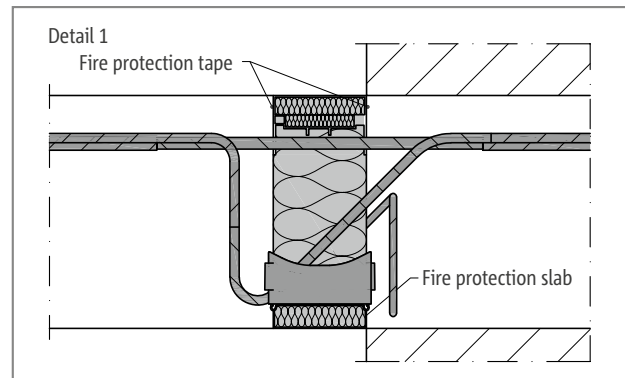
Schöck Isokorb® T type K-E, K-T for REI120: Detail 1
